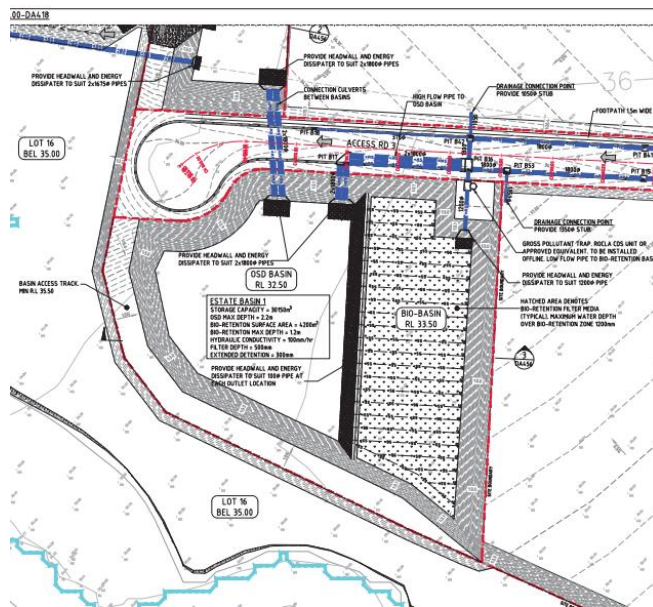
(above) – Basin 1 - Excerpt from approved Costin Roe Civil works plan Sheet 9, revision K.
